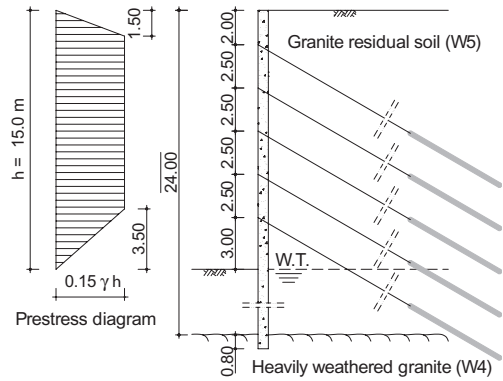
Geometry of the excavation and ground anchors prestress diagram.
